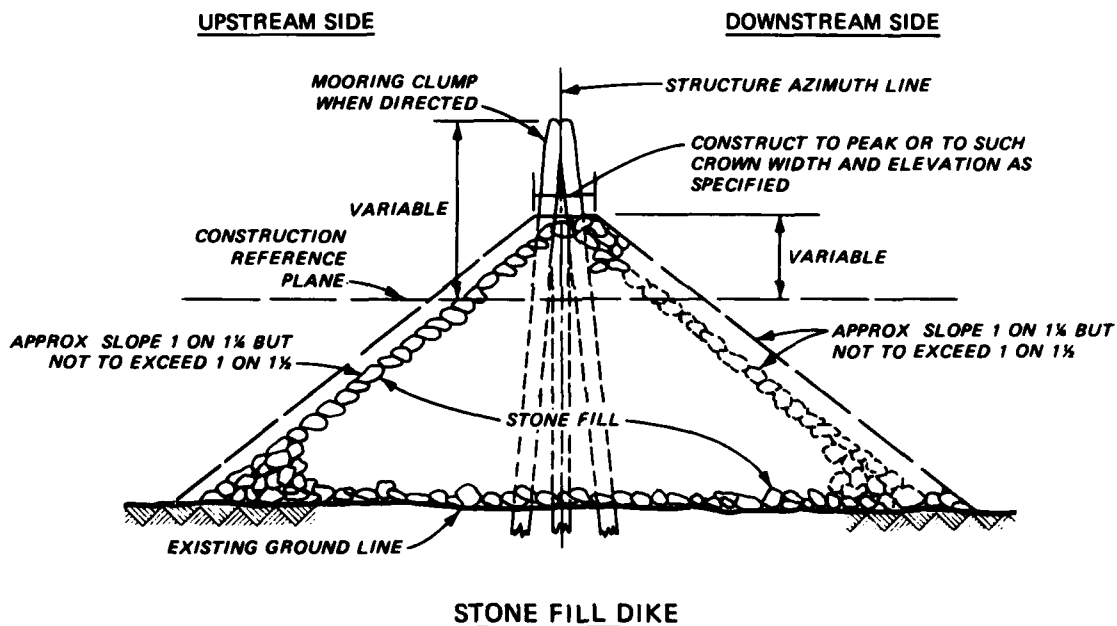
Pile clumps in stone dike cross section (after U. S. Army Engineer District, Omaha (1964))
